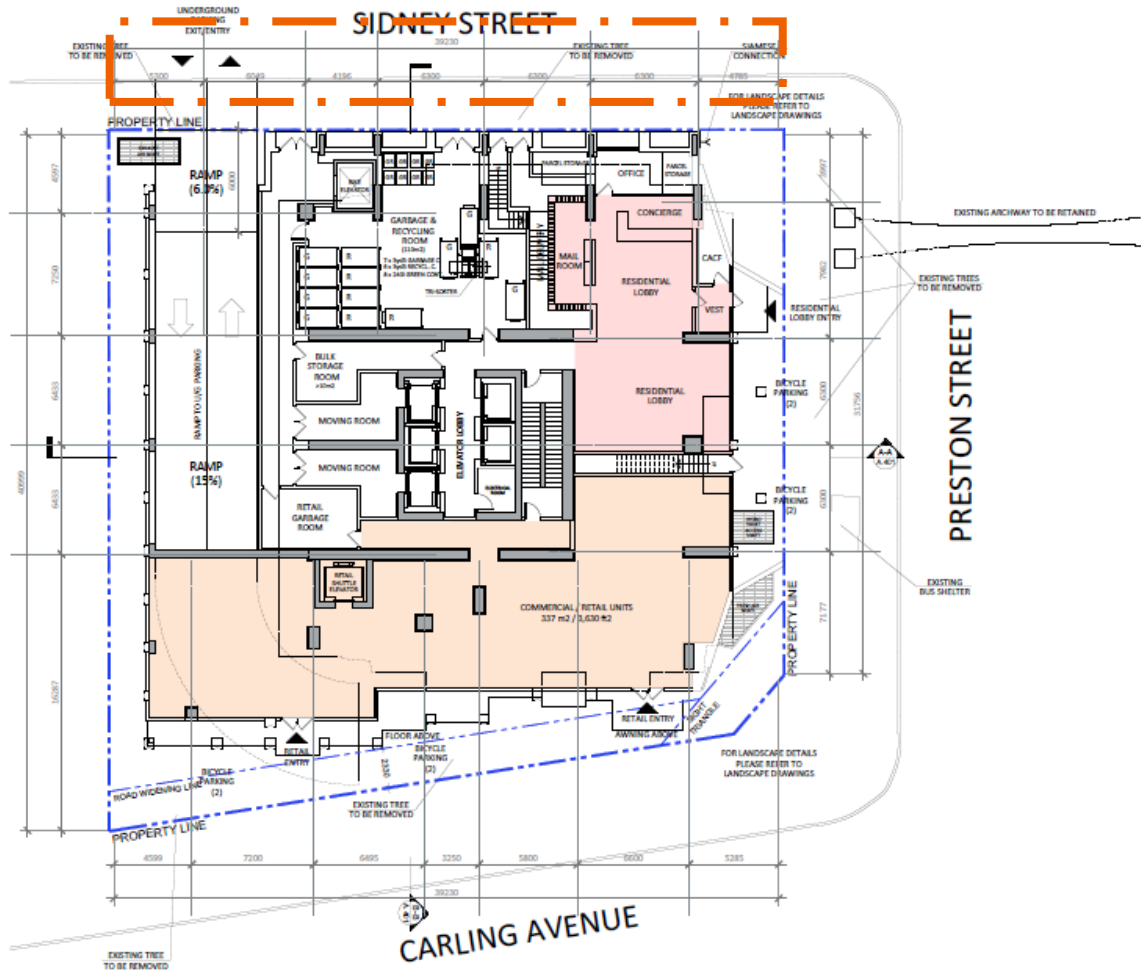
Proposed Development, First Floor Plan, loading and servicing area highlighted
